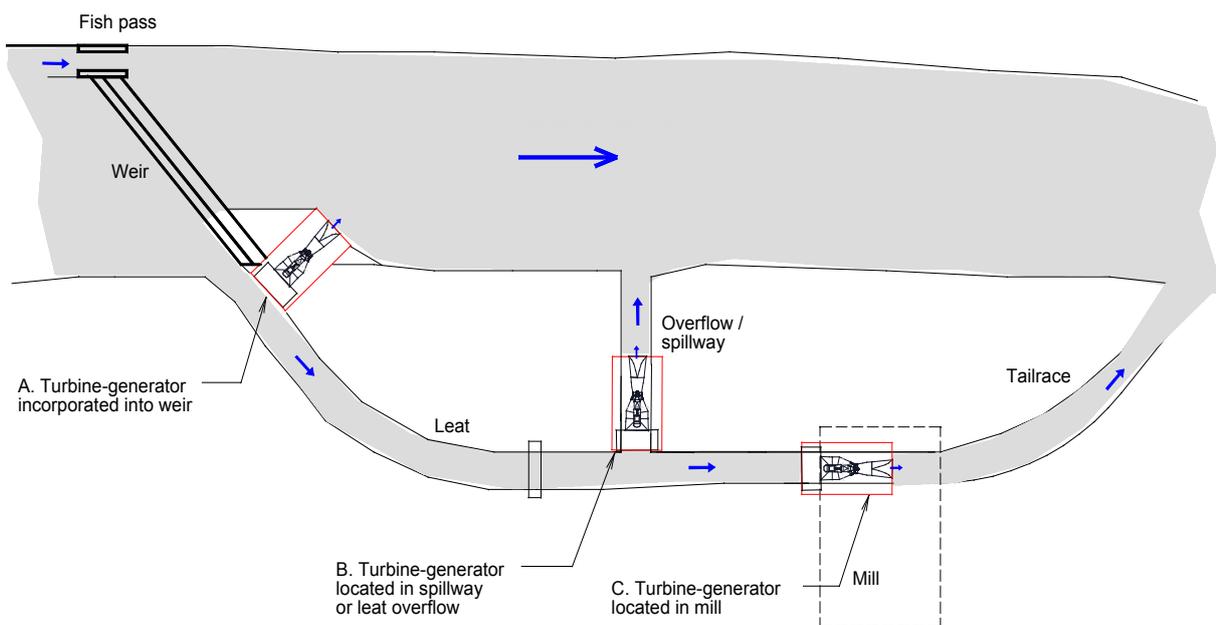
Layout possibilities of a turbine-generator located at a former mill
